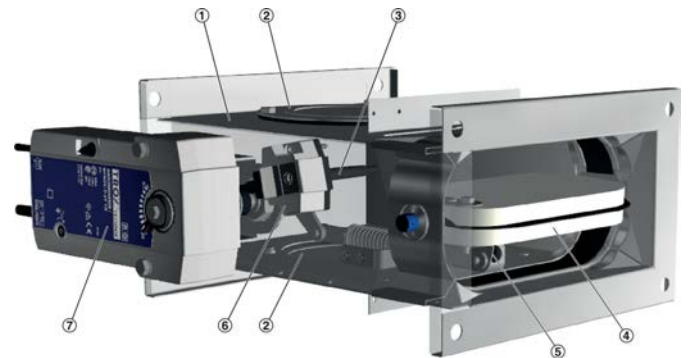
FKS-EU with spring return actuator (drawing BFN)
